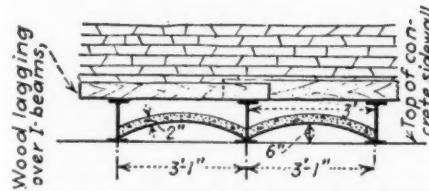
To stop falling material, precast concrete arches are installed between I-beams on the shaft bottom.
